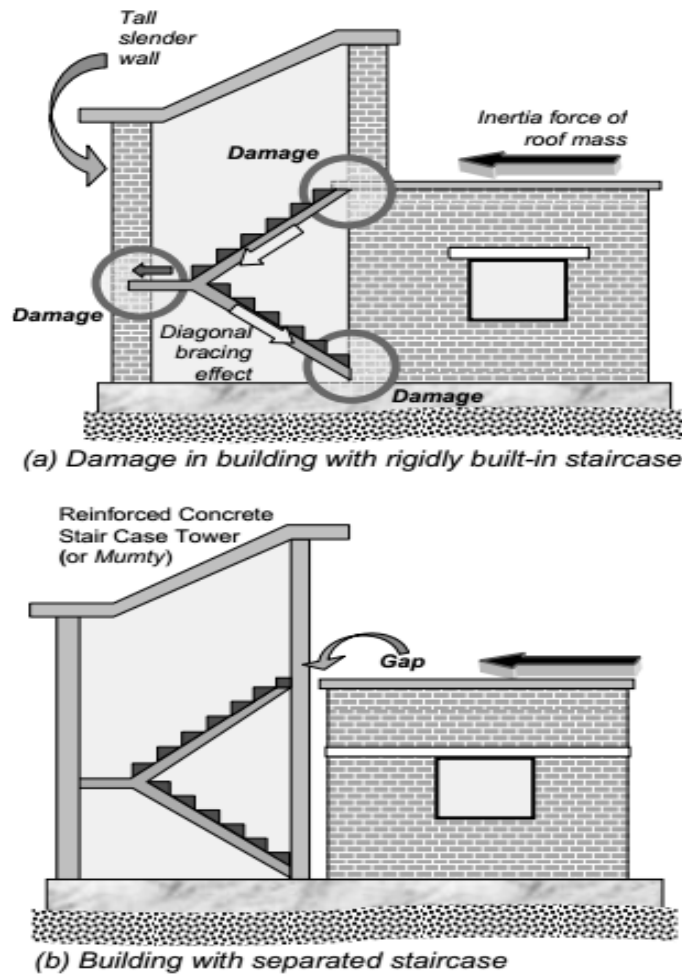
Seismic Detailing of staircase in masonry building [43].
